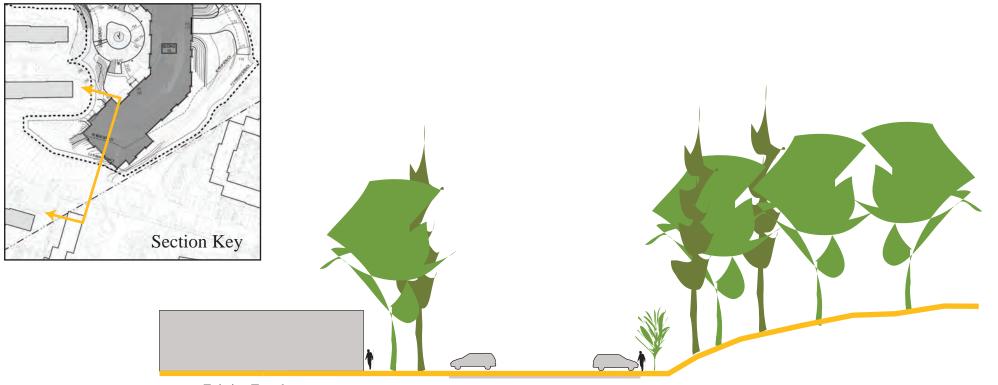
Garage Elevations Source: Chestnut Hill Realty c.40B Proposal, June 10, 2013
